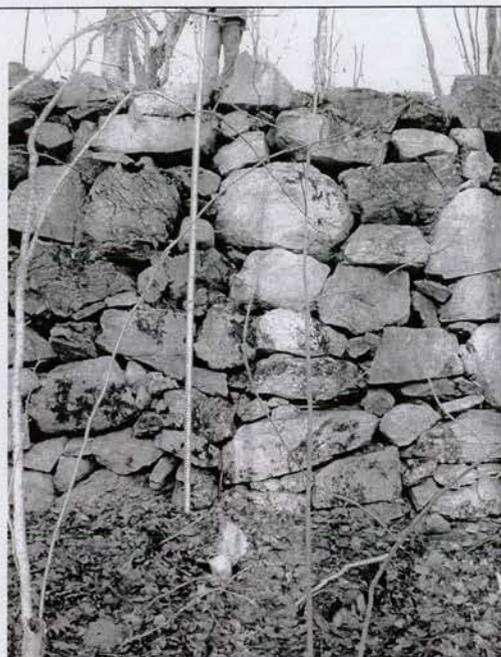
7-12-1-2005 London Bridge E wall, North to South, 8A View W
